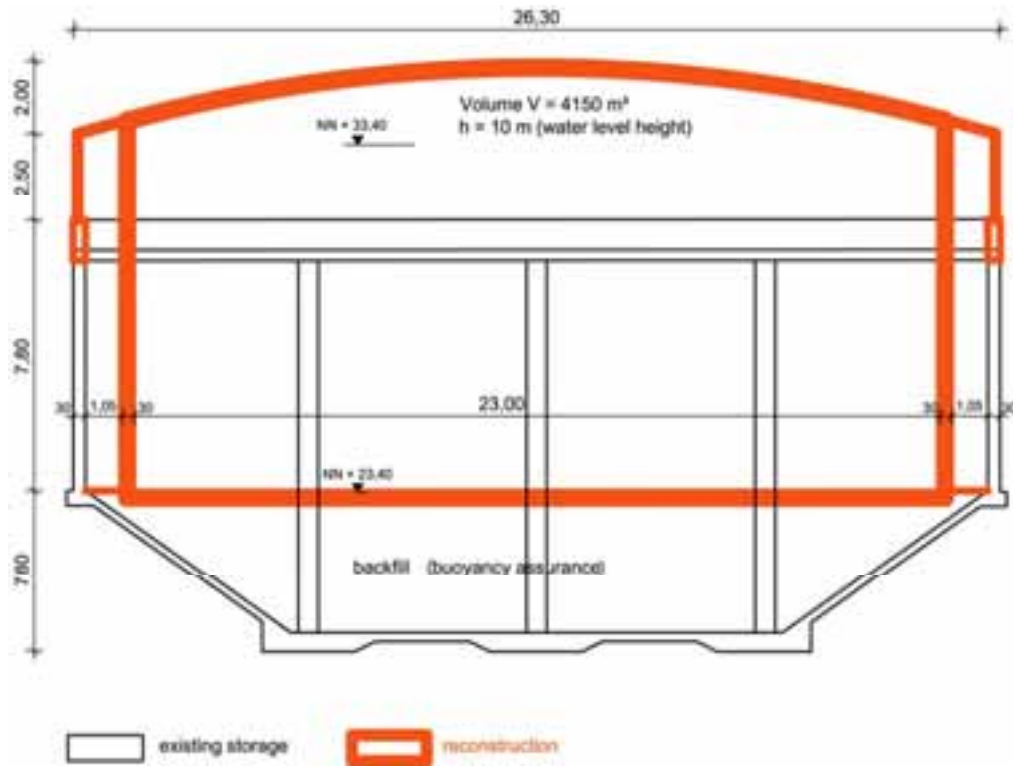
Reconstruction concept for the storage (source: HGC – Hamburg Gas Consult GmbH)
